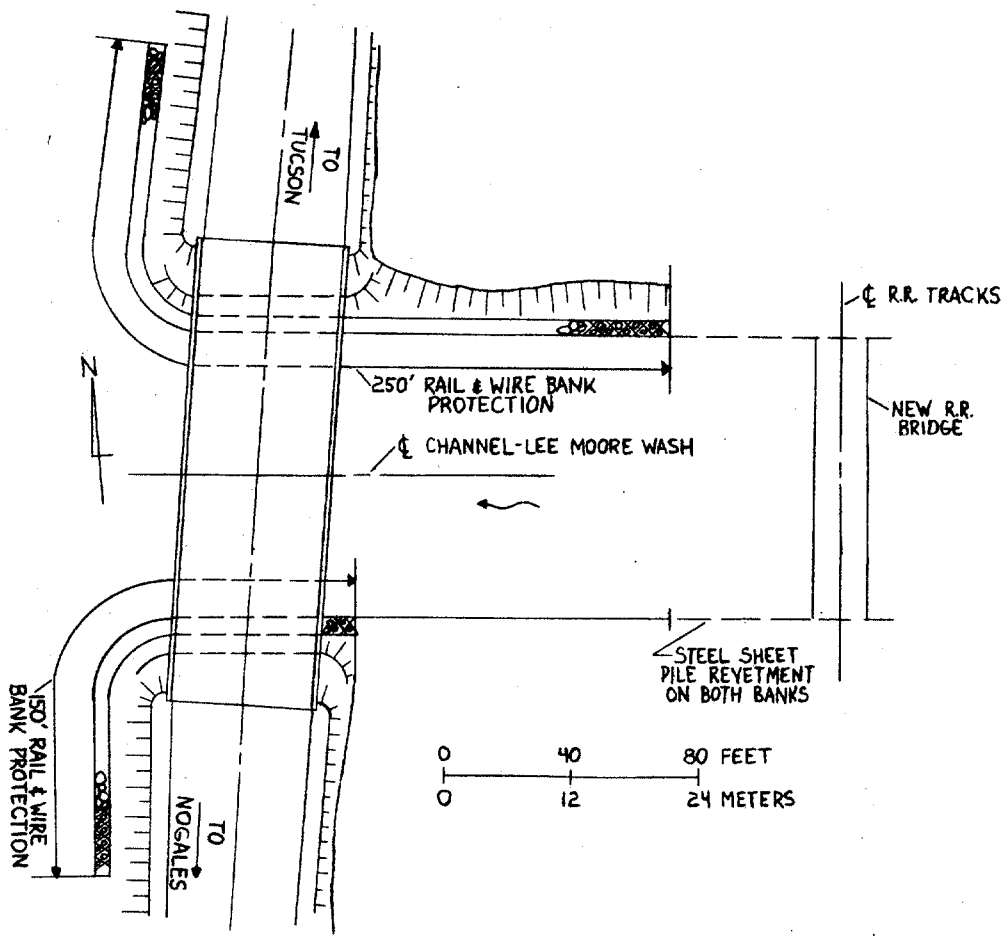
Plan of bridge and countermeasures constructed in 1973.
